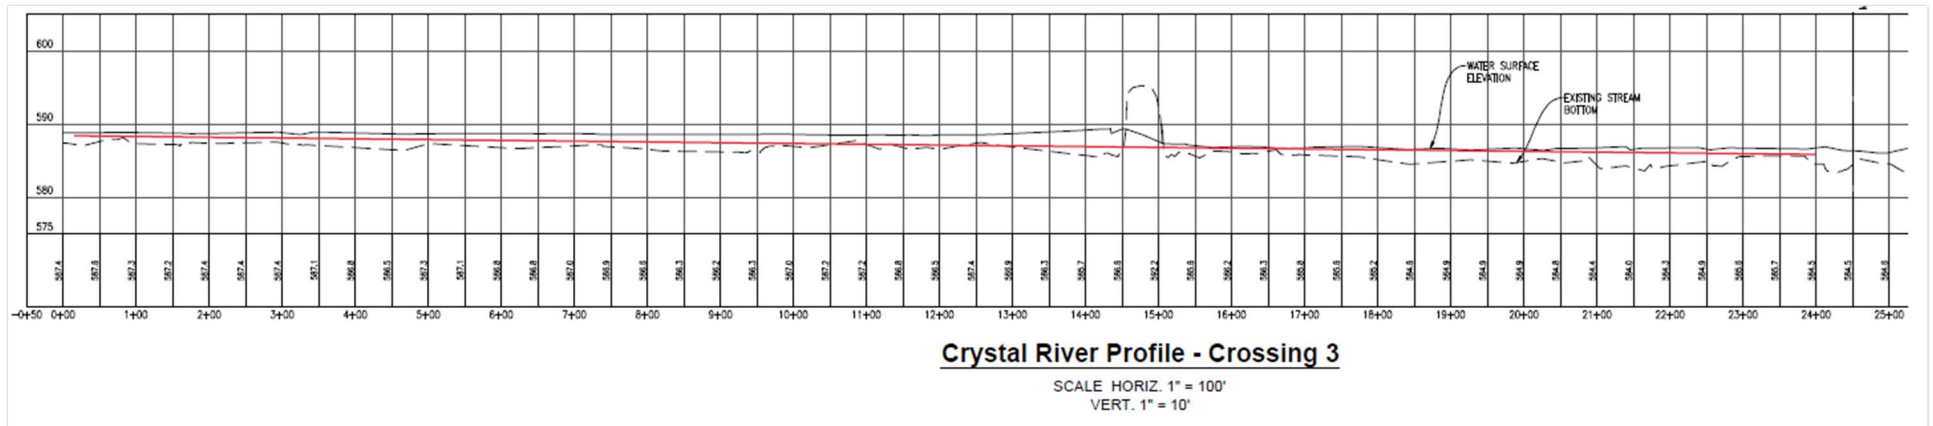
Crystal River Profile, Crossing #3. Dashed line shows existing stream bottom, single dark line shows water surface elevation and red line illustrates the continuity of streambed elevations from downstream to upstream of the crossing.
